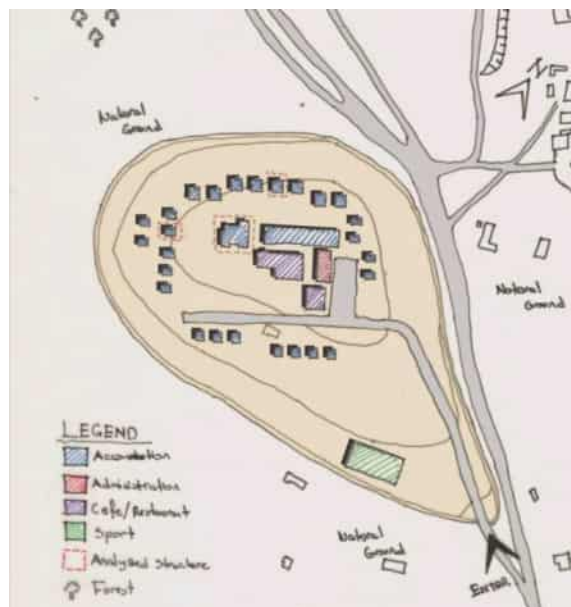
Hidirnebi Yayla Kent-I Layout Plan.
